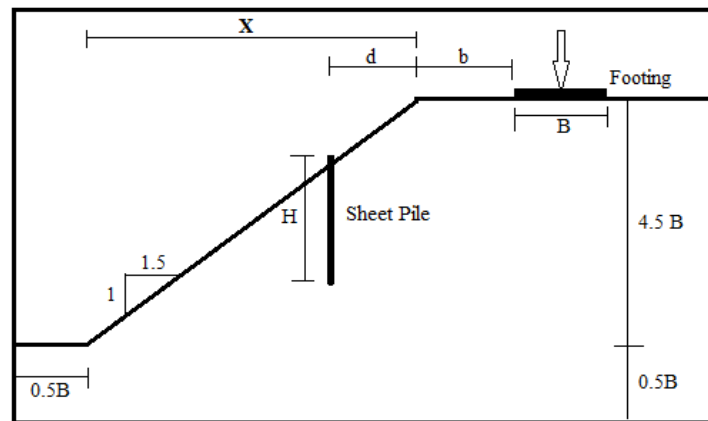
Geometric parameters of sheet pile -stabilized sand slope model
